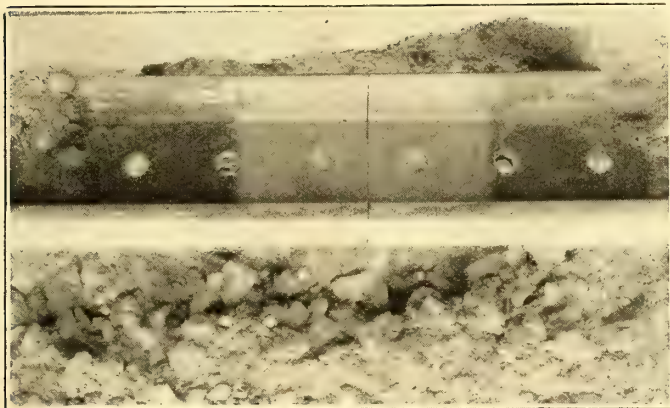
JOINT AFTER BEING CLEANED, MILWAUKEE
